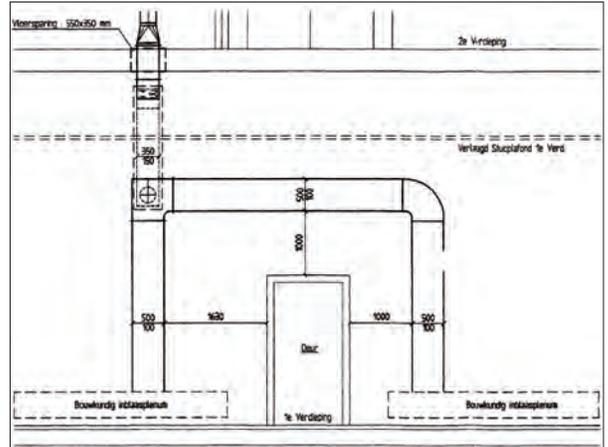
The supply air ducts in the galleries are connected to a wall inlet
